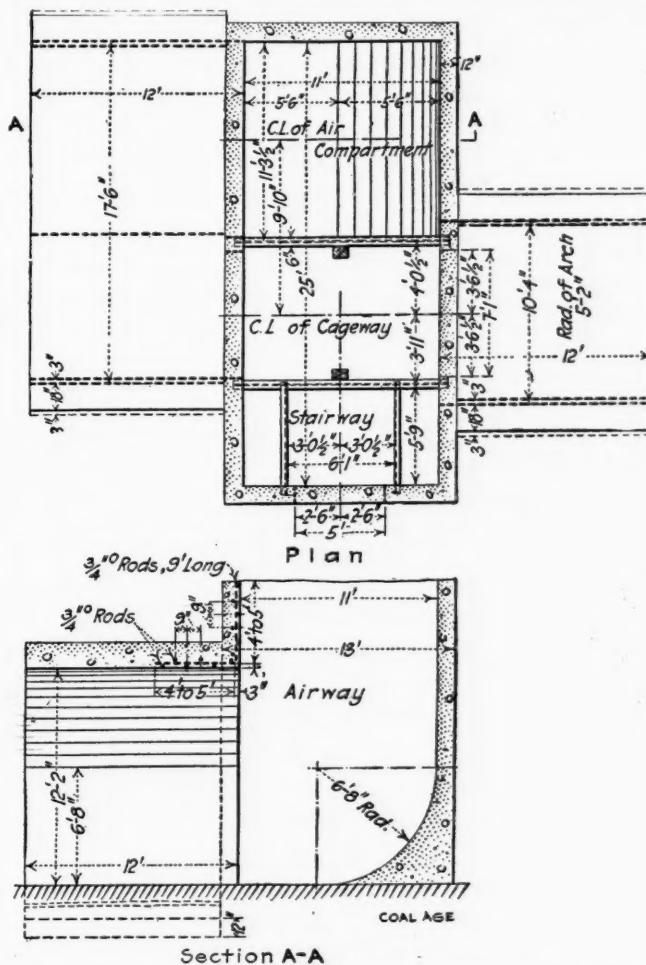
PLAN AND SECTION OF AUXILIARY SHAFT BOTTOM
